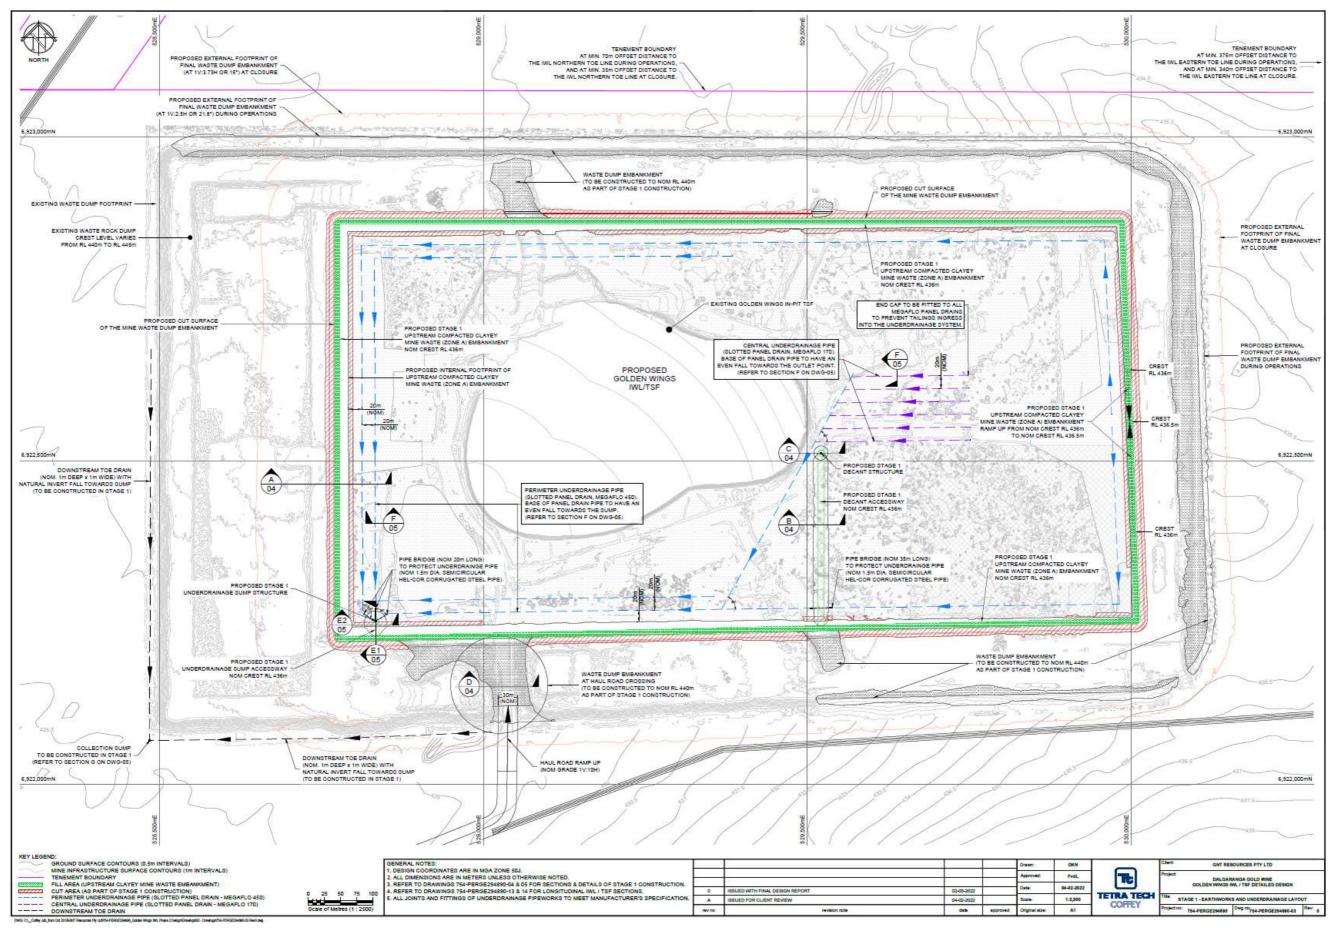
Golden Wings TSF design - Stage 1 and underdrainage system
